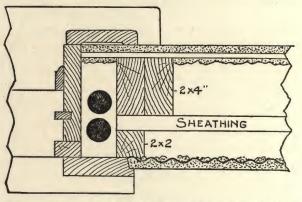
Section of a window frame as constructed in a cement plaster house.
